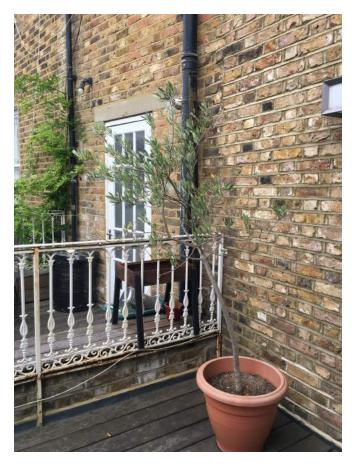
View from first floor terrace of no. 7 King Henry's Rd towards no. 9 King Henry's Rd obscured glass door.
